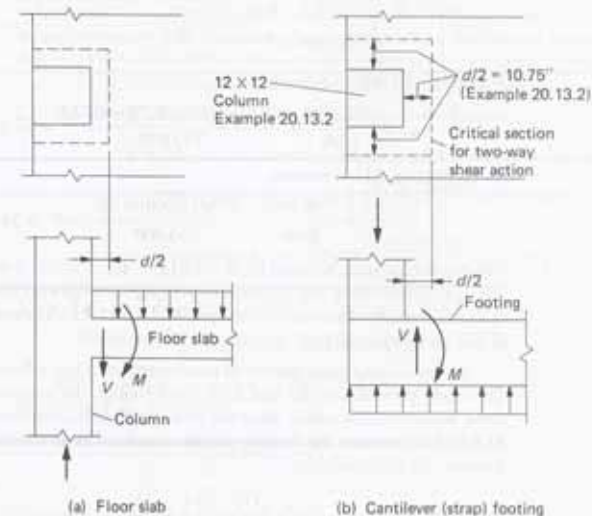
Comparison of forces to be transferred between floor slab and column to those between exterior footing and column in cantilever (strap) footing.
